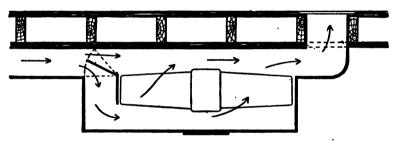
Another Arrangement of Mixing Damper and Heater in Galvanized-Iron Casing. Heater between Damper and Register.
